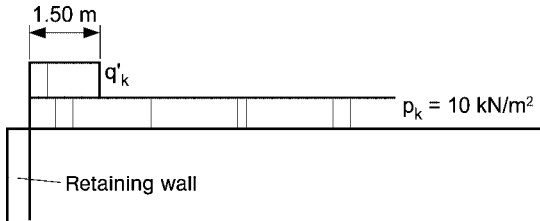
Equivalent loads for road traffic at less than 1.00 m from the retaining wall
